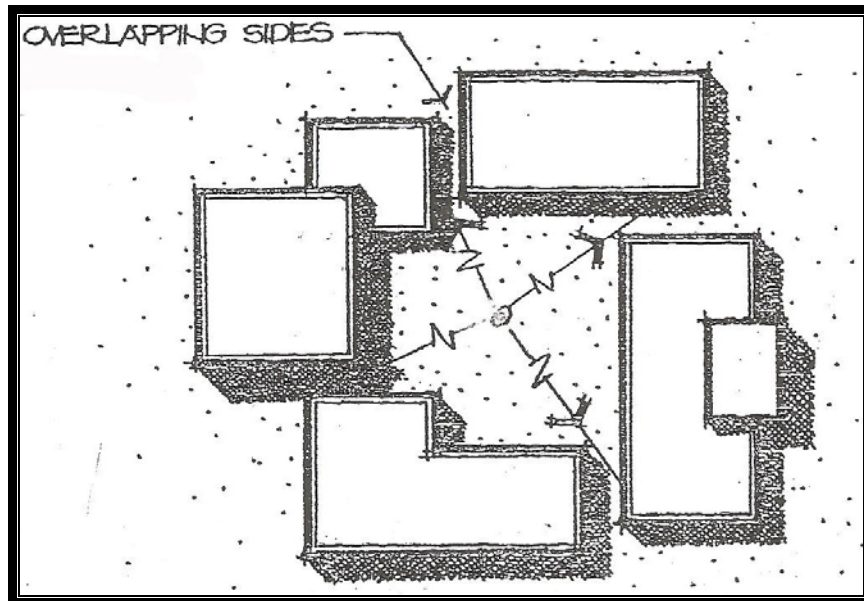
Outdoor Space around the Overlap Building Facades
